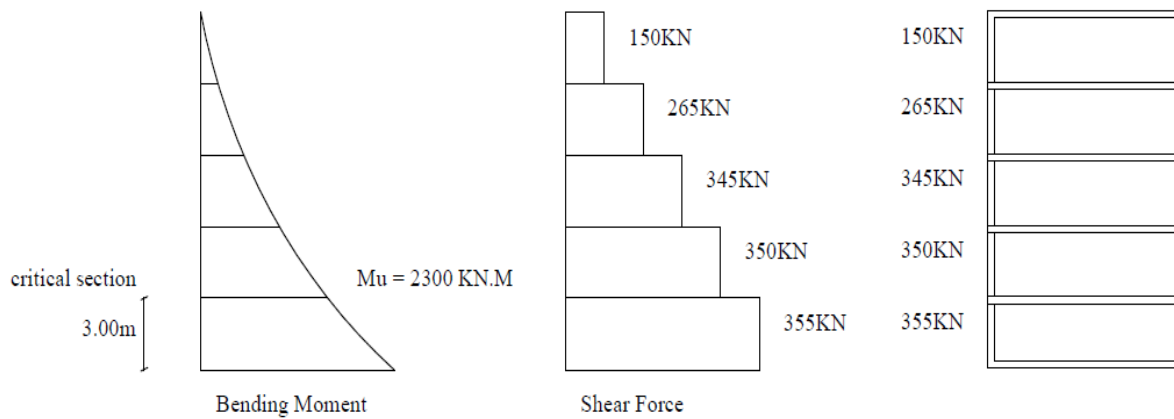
Shear and Moment Diagrams of Shear wall
